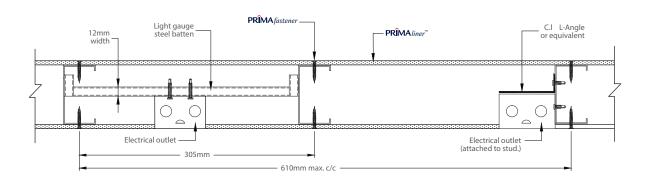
Electrical outlet in between section C-C and electrical outlet attached to stud
